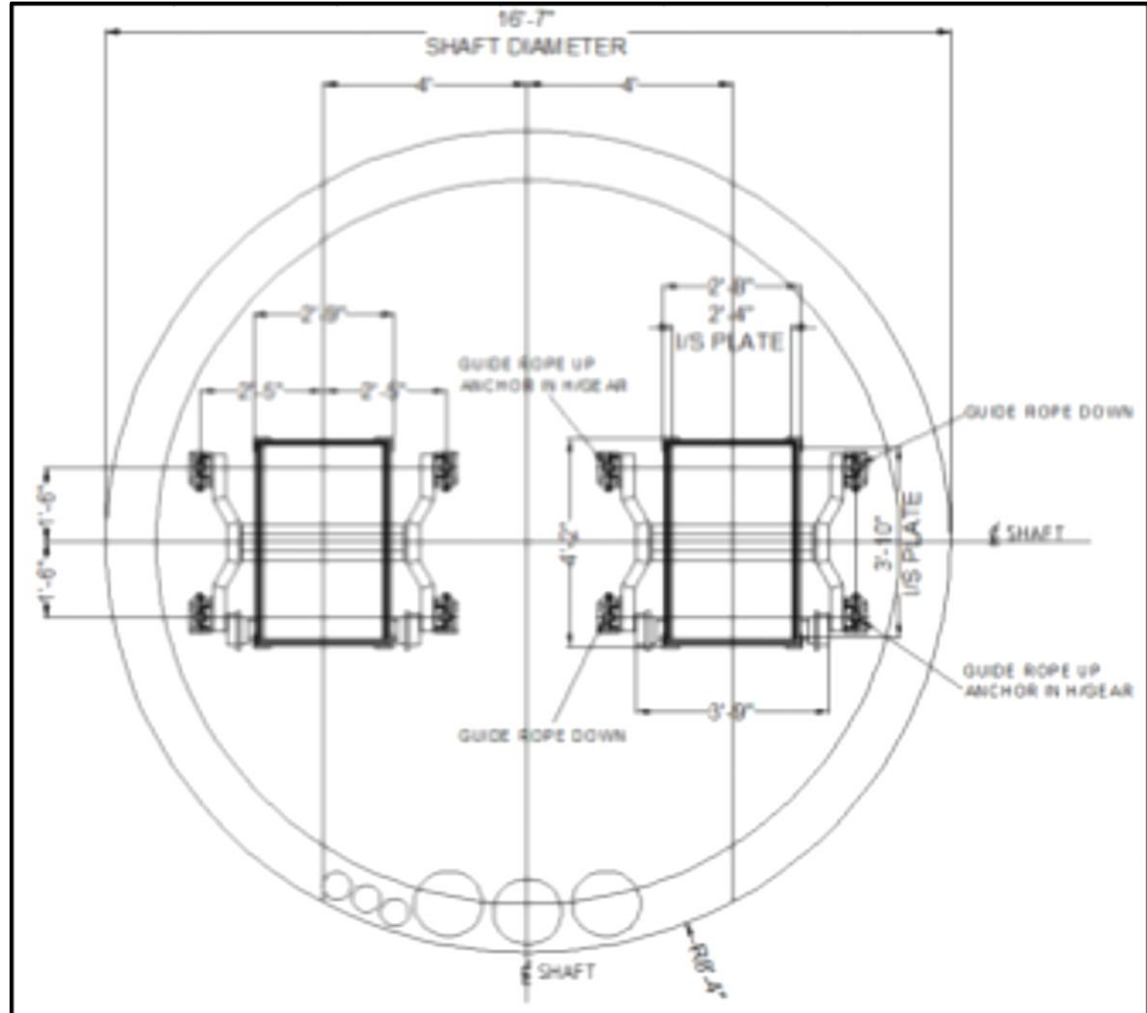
Cross-sectional view of the proposed raise bore internal shaft with two 6.5 t skip assemblies on guide ropes
